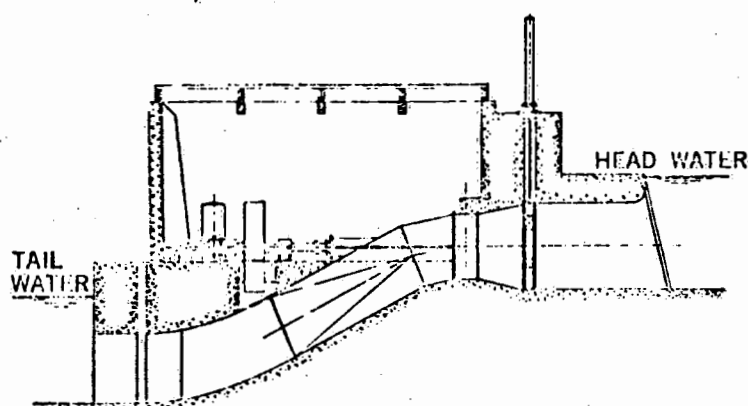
TUBE turbine with fixed-wheel intake gate.
